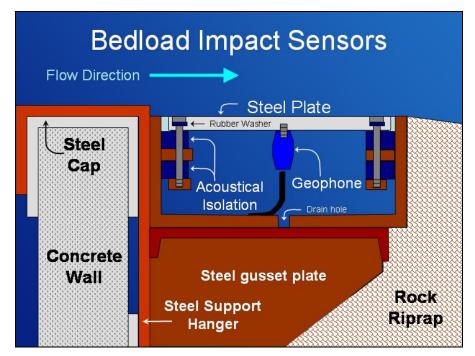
A cross section detail of the weir crest shows the bedload impact sensors and steel gusset support plates attached to the steel cap on the concrete wall.
